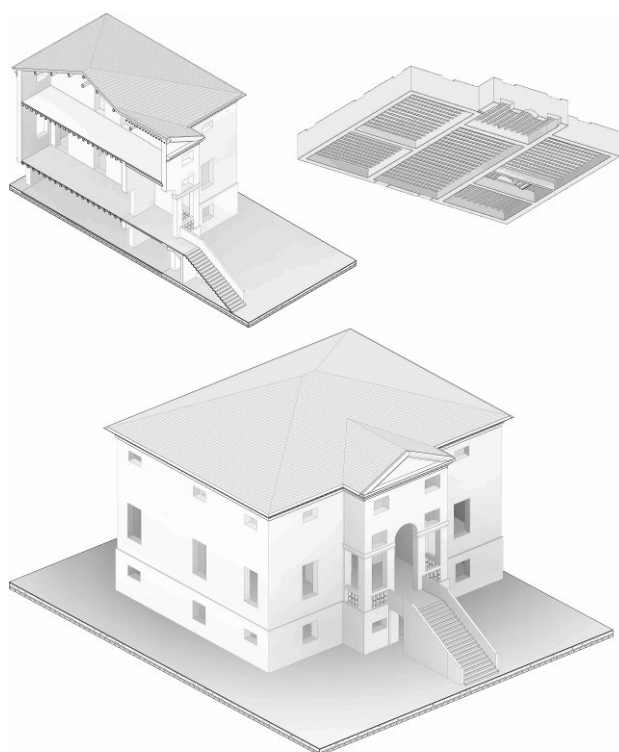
Geometric modelling of the villa. At the top, a vertical section and an opposite view of the first-floor ceiling, at the bottom, the entire model of the villa, from outside.
